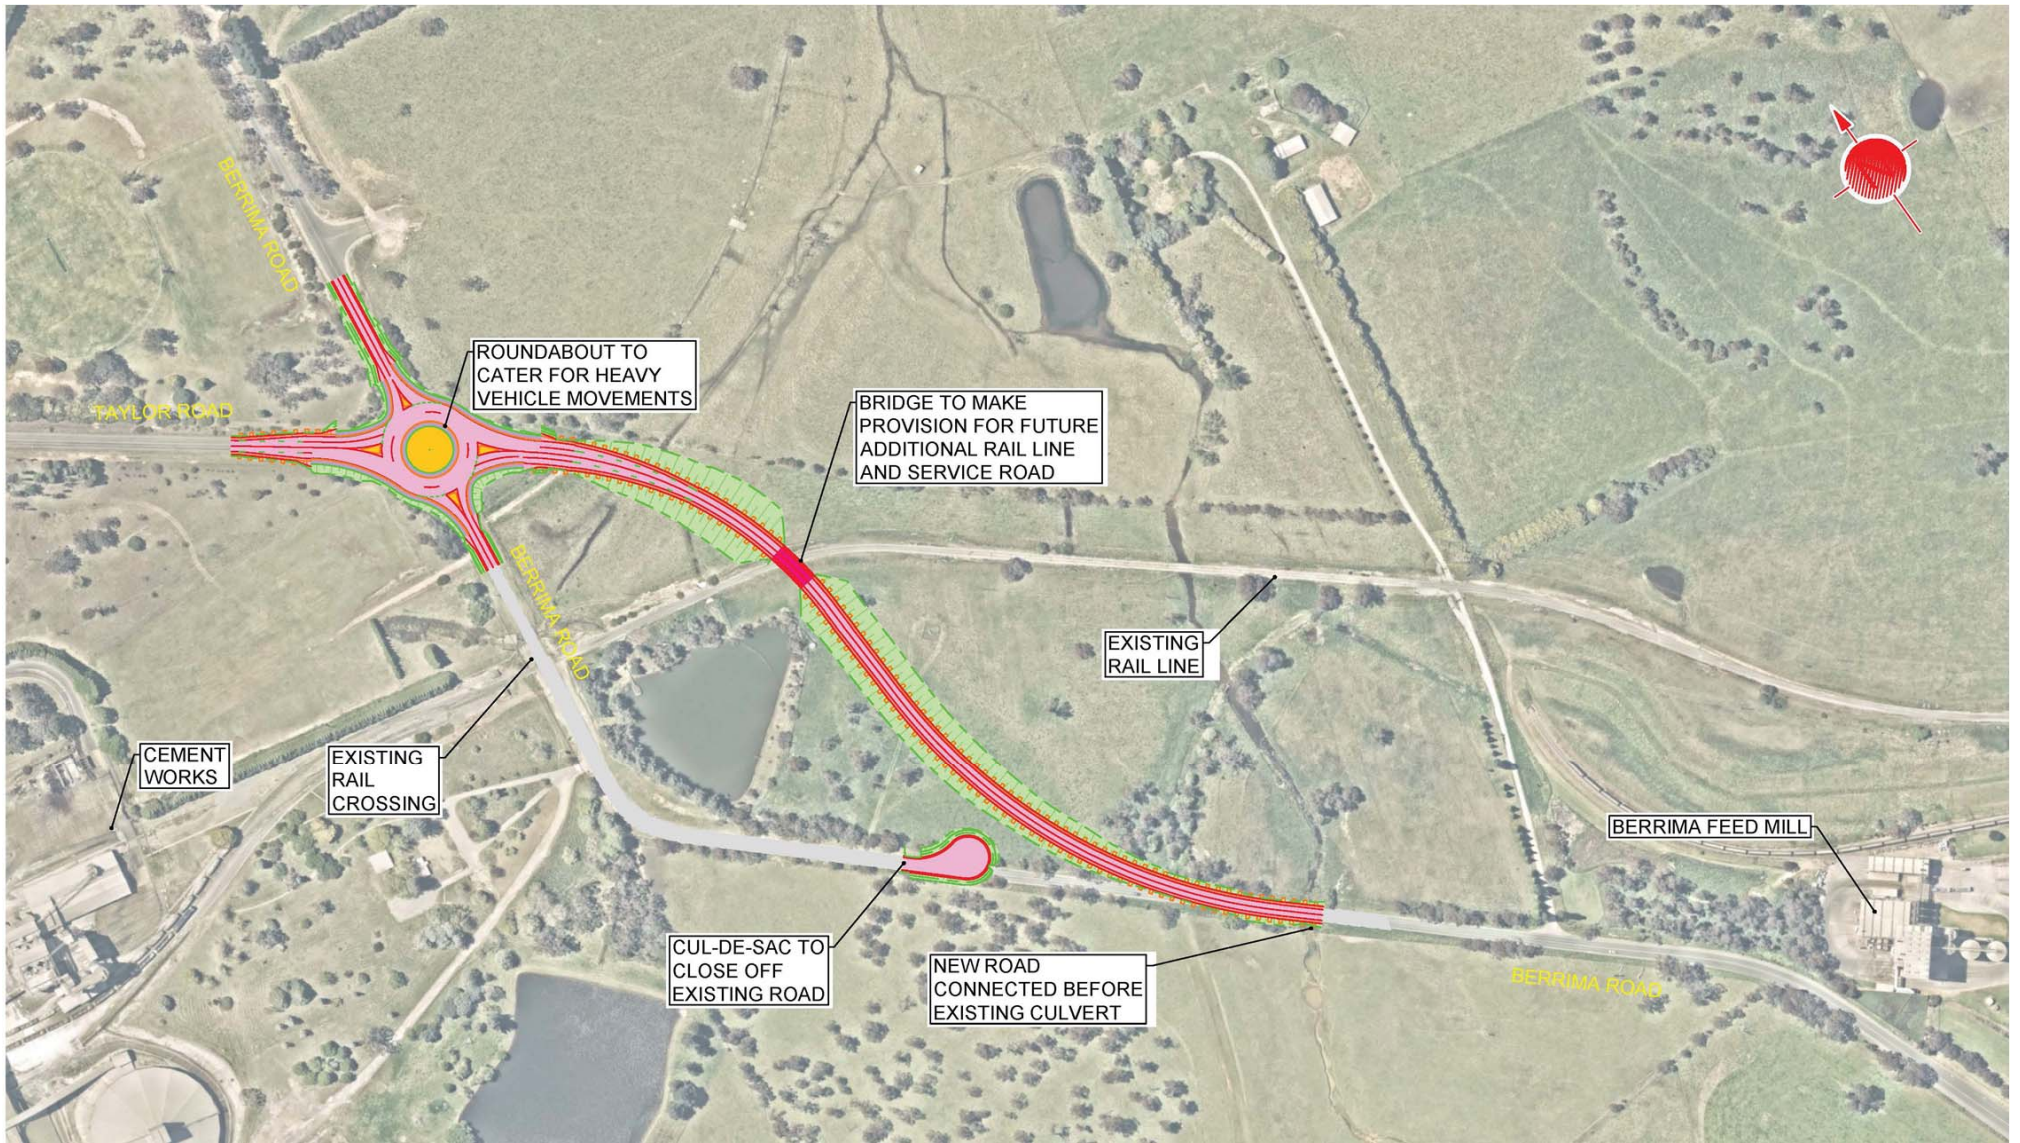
Proposed Wingecarribee Shire Council Berrima Road deviation project layout plan
